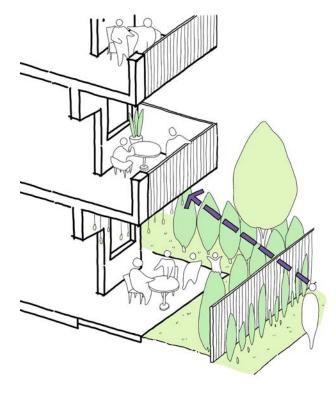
Fencing and layered planting provides privacy for interior living spaces and outdoor areas. Units may have direct access to the public sidewalk, but it's not required.
